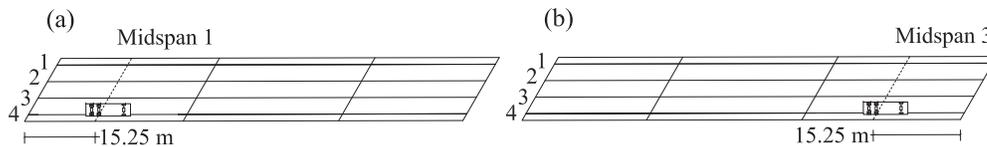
Static test configurations. (a) Static test 1. (b) Static test 2.
